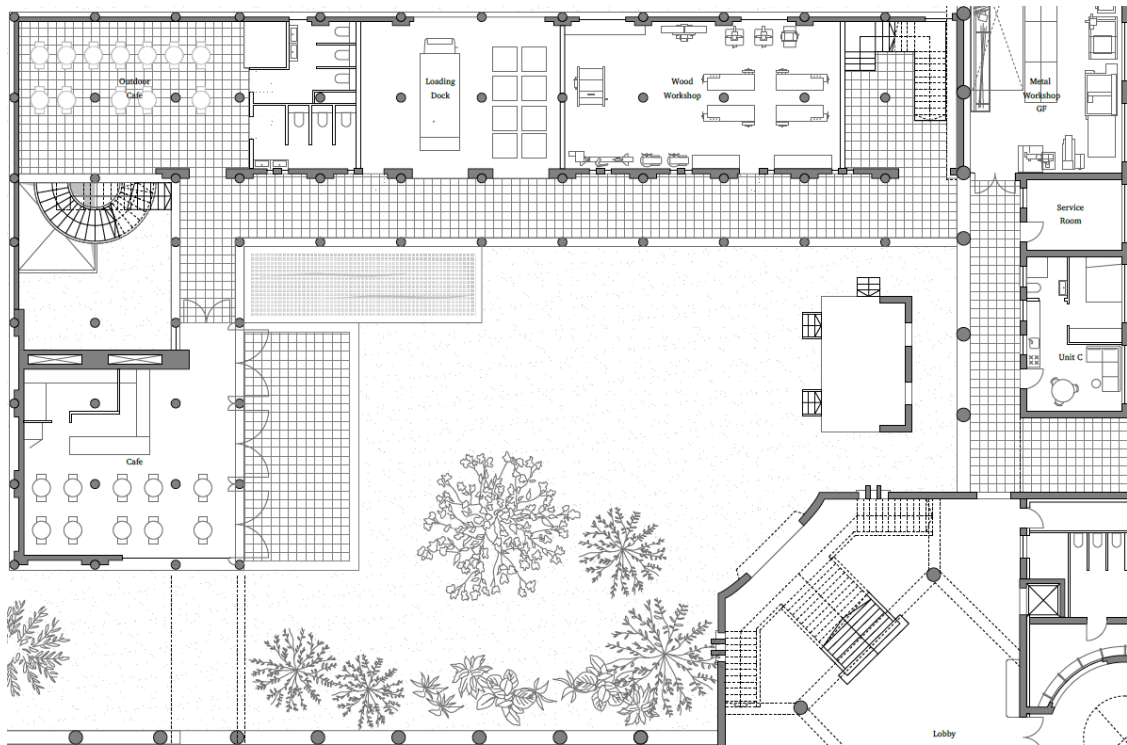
Courtyard floor plan, showing the four elements: stage, water source, closed garden and café (Source: by author).
